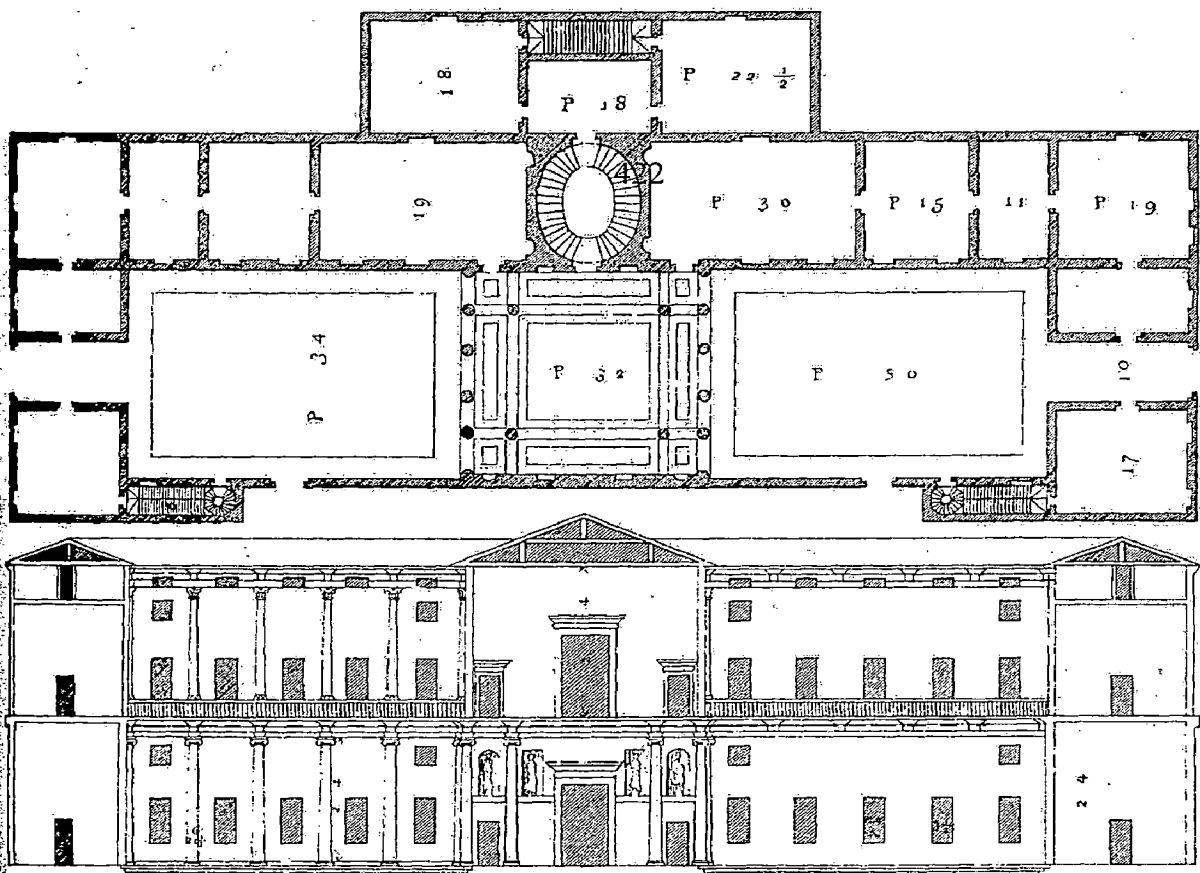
Palazzo Giovanni Battista Della Torre at Verona in plan and cross section
